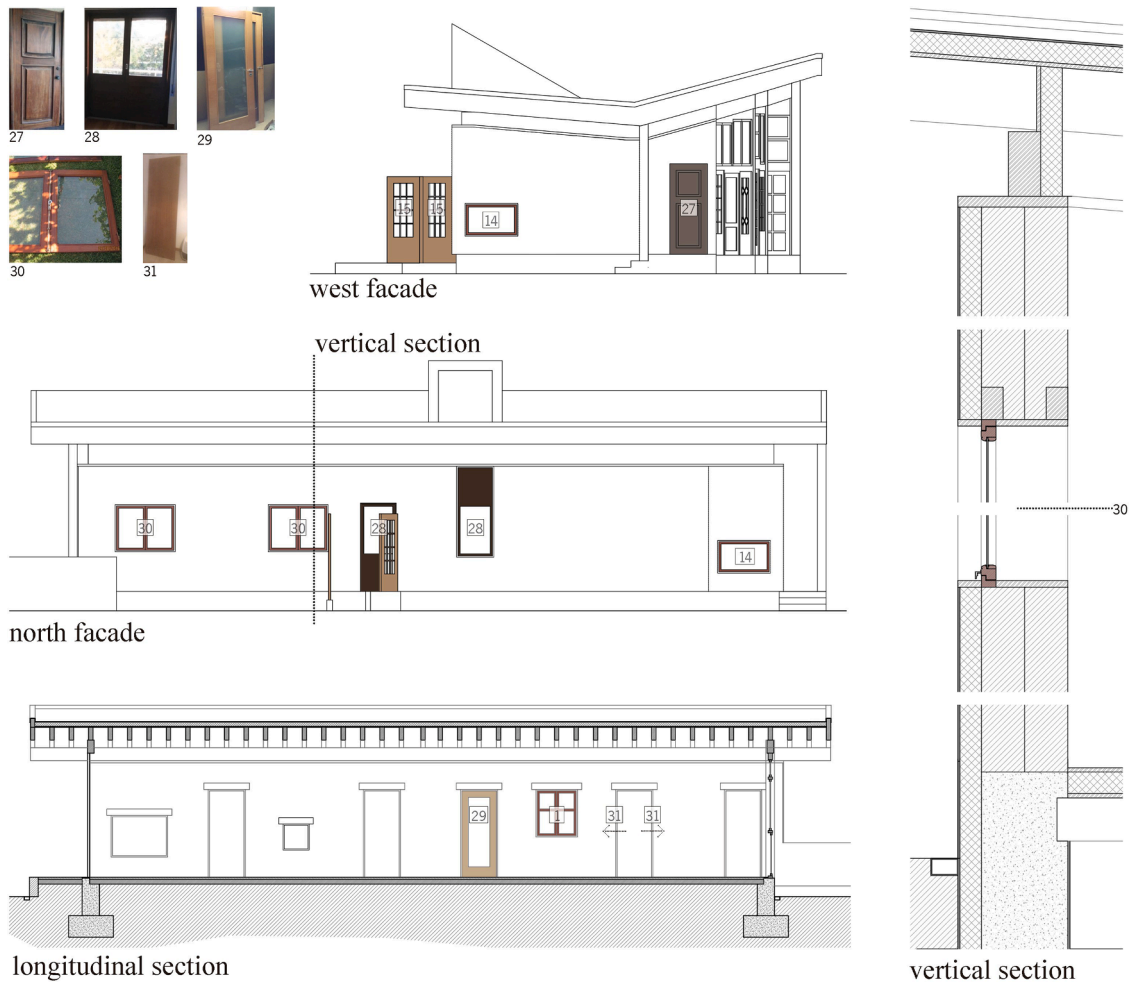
Reused window frames in west and north facades and vertical section of the Case Study House (adapted from [3]).
